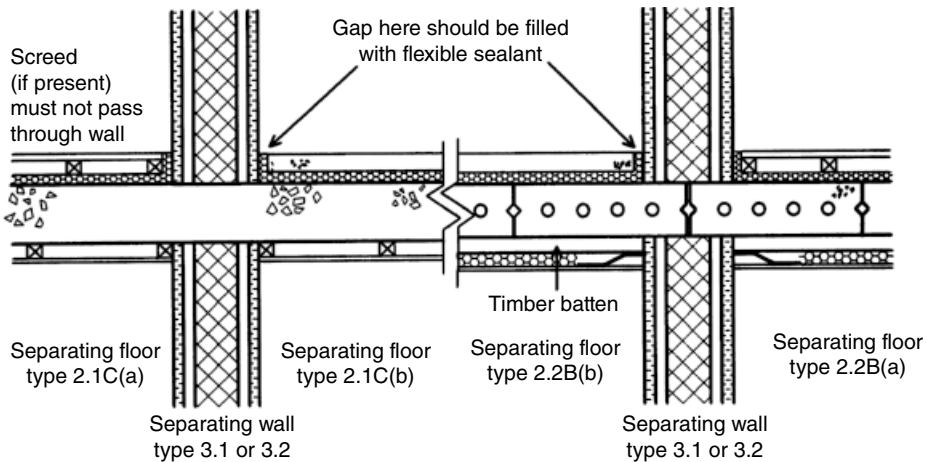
Details of junctions between Type 2 separating floors and Type 3 separating walls.
